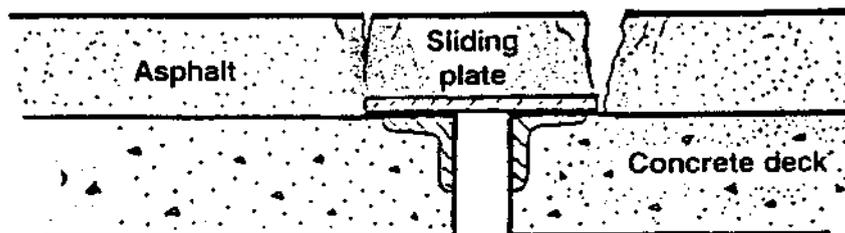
Cracked Asphalt at Deck Joint
